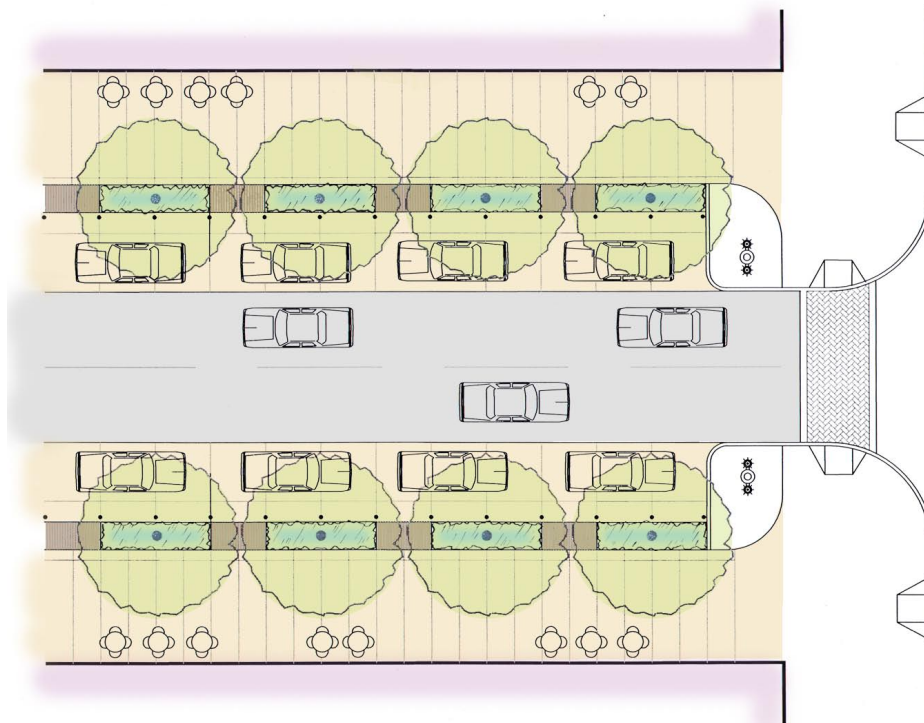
When redesigned with parallel parking, this street gains significantly wider sidewalks, more green space, and better opportunities for stormwater management.
